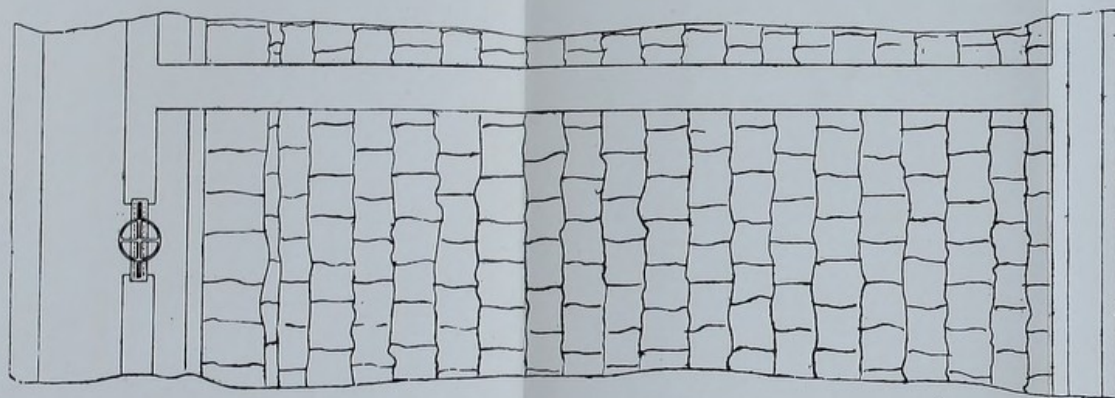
SLATE BED, PLAN OF TOP LAYER.
